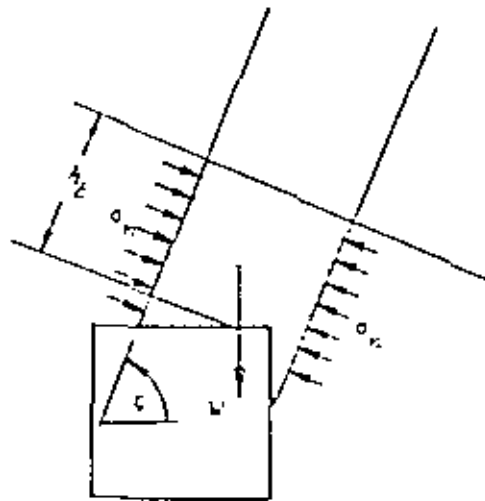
Influence of in situ stress on the stability of a block in the roof of an excavation.
